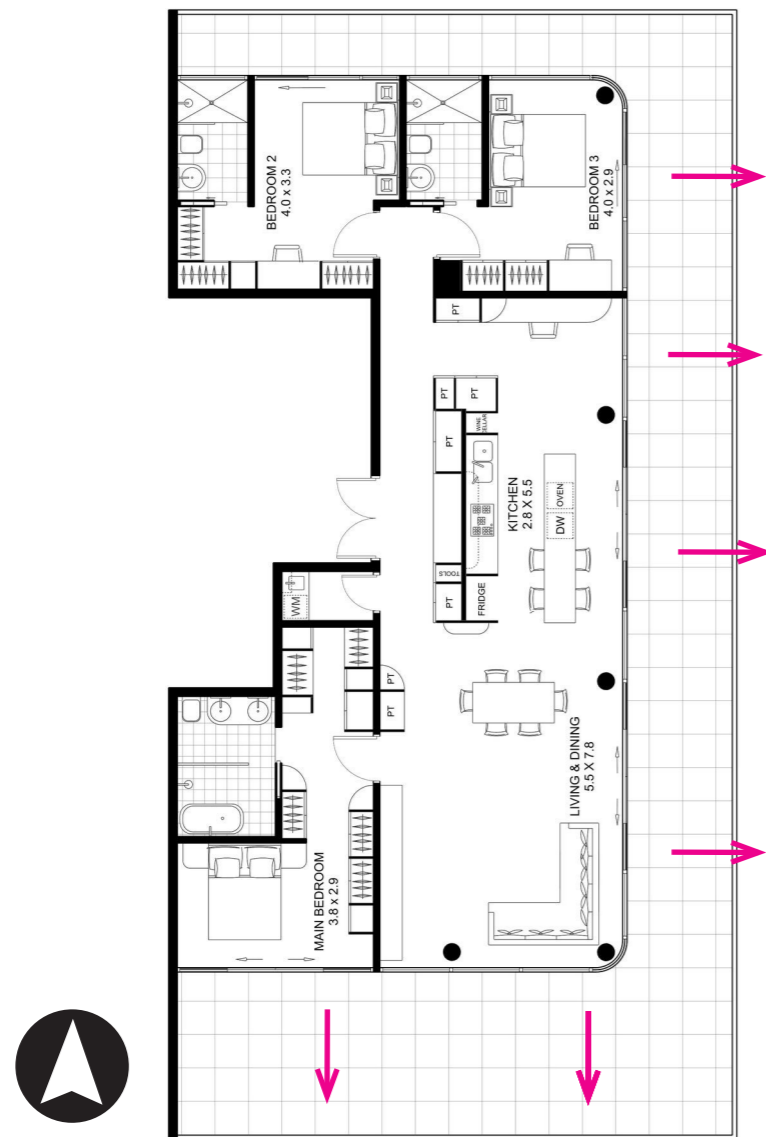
Example floor plan from Latitude Apartments (55 Lavender Street), unaffected views indicated in pink.
